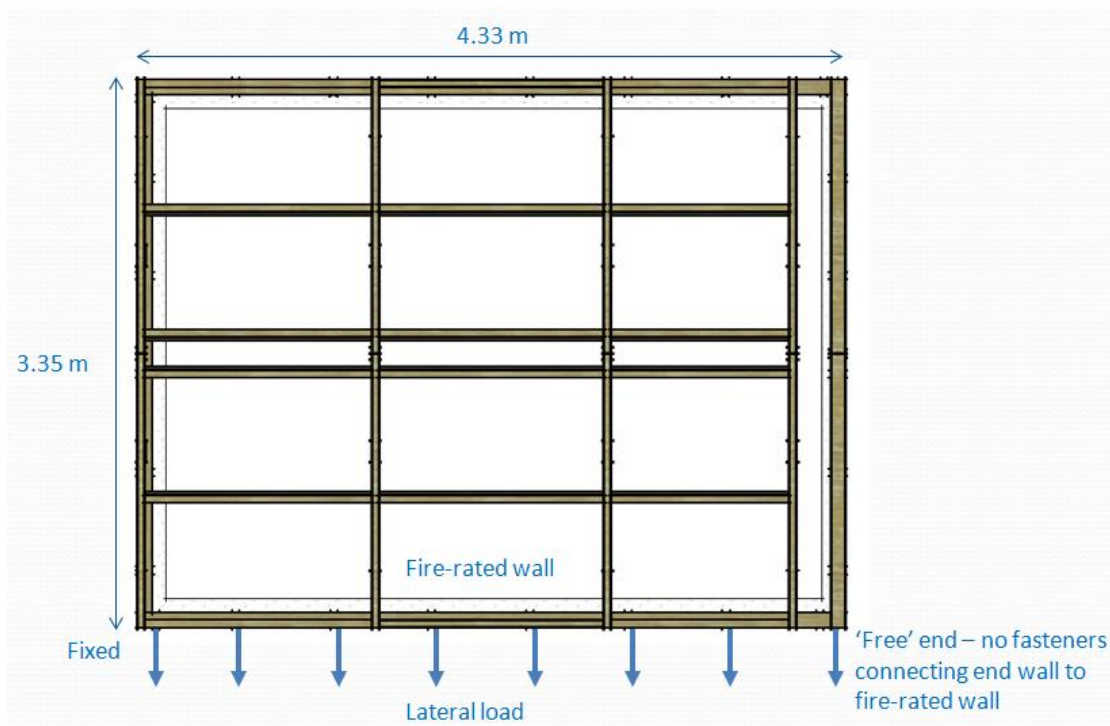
Sketch showing that one end of the fire-rated wall 'disconnected' from the end wall
